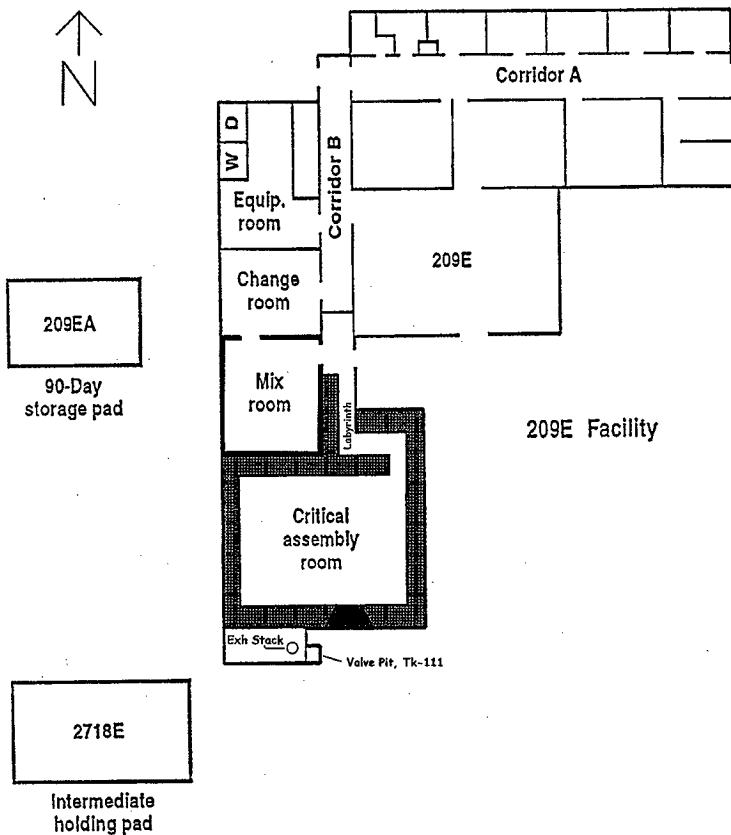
Critical Mass Laboratory, 209E Facility, Facility Layout
